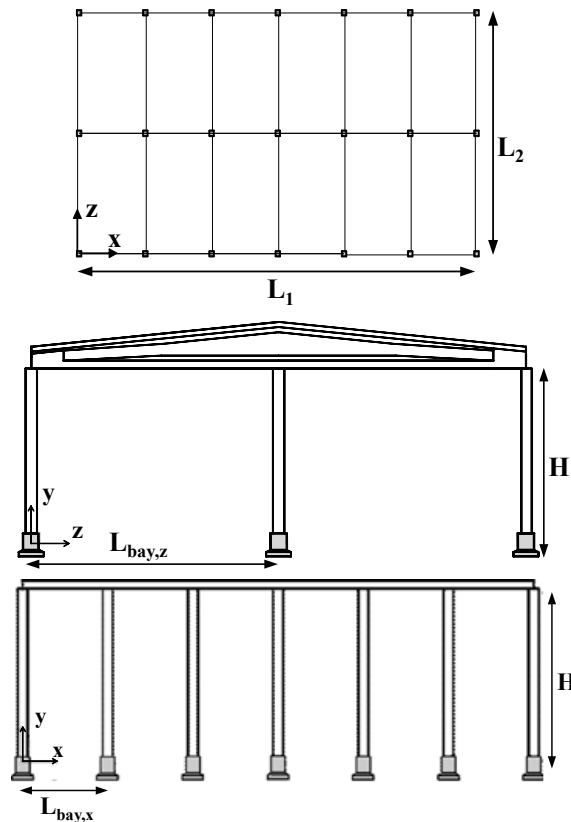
Benchmark one-story precast building: a plan view, b transversal bays and c longitudinal bays
